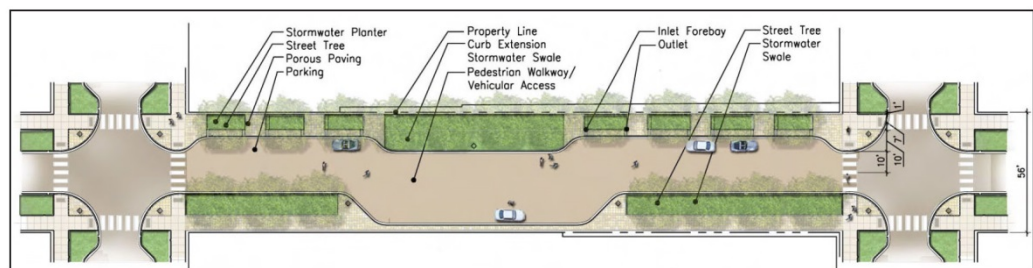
Green street master plan: ROW Plan. Figure shows that cars are encouraged to drive slowly, with the help of using the curb extensions. (Gateway Green Streets master plan 2008)
